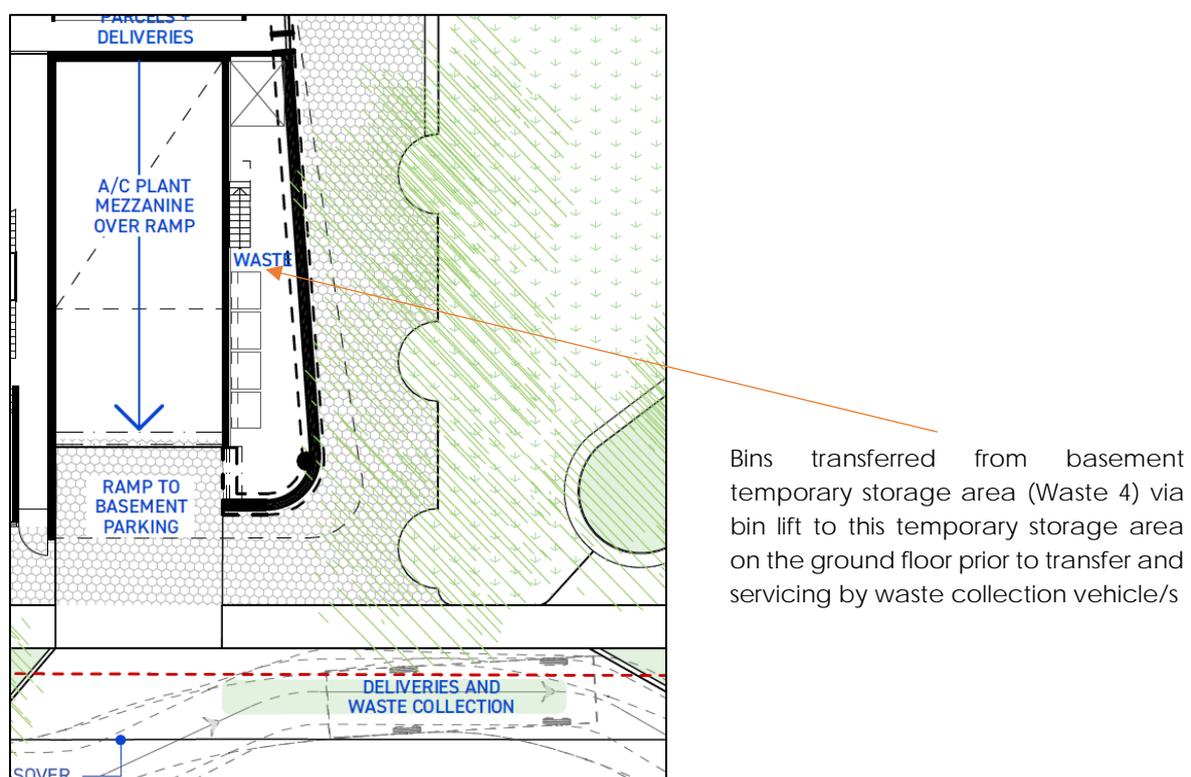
Location of temporary bin storage and transfer area on the ground floor
